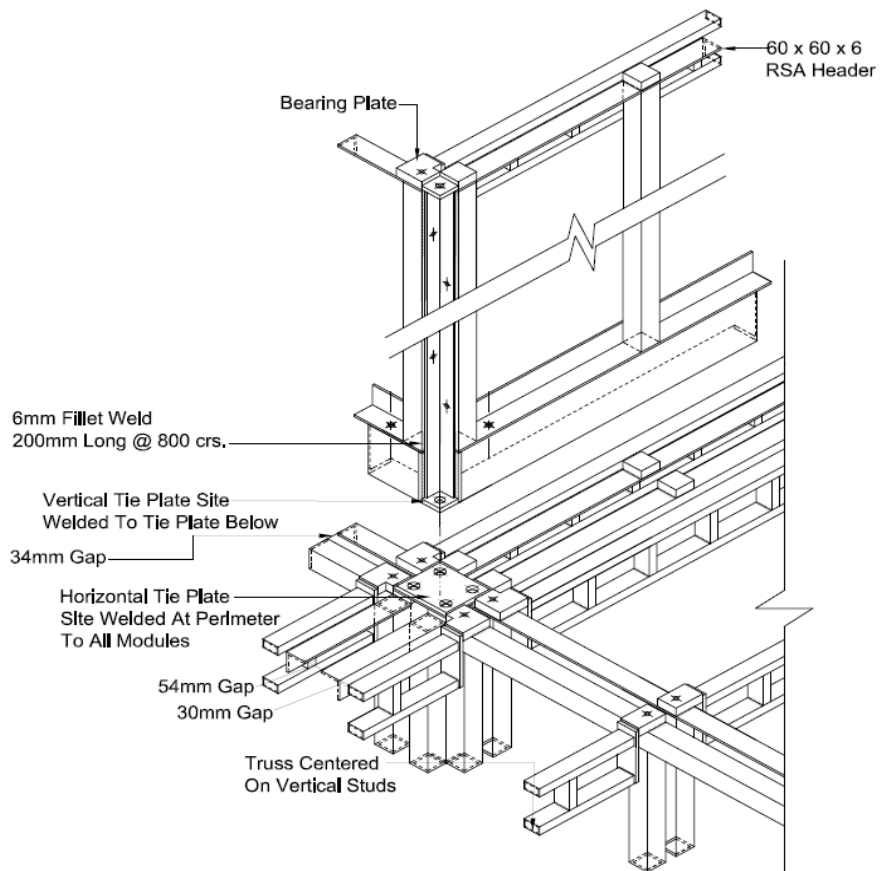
, Typical corner detail showing structural components of module (expanded isometric)
